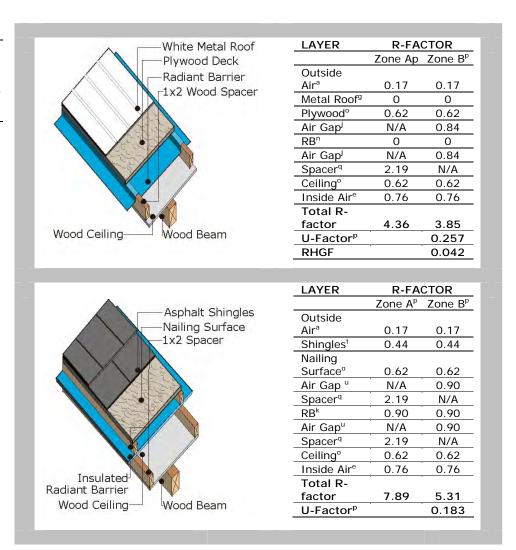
Sloped roof constructions with radiant barrier and open beam ceiling
